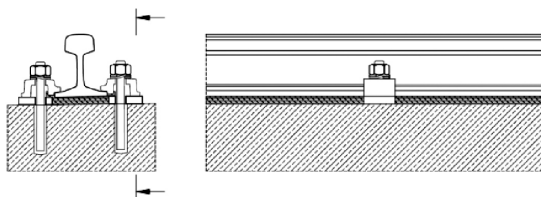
Mixed rail fastening system (direct rail fastening to concrete slab) [11]
